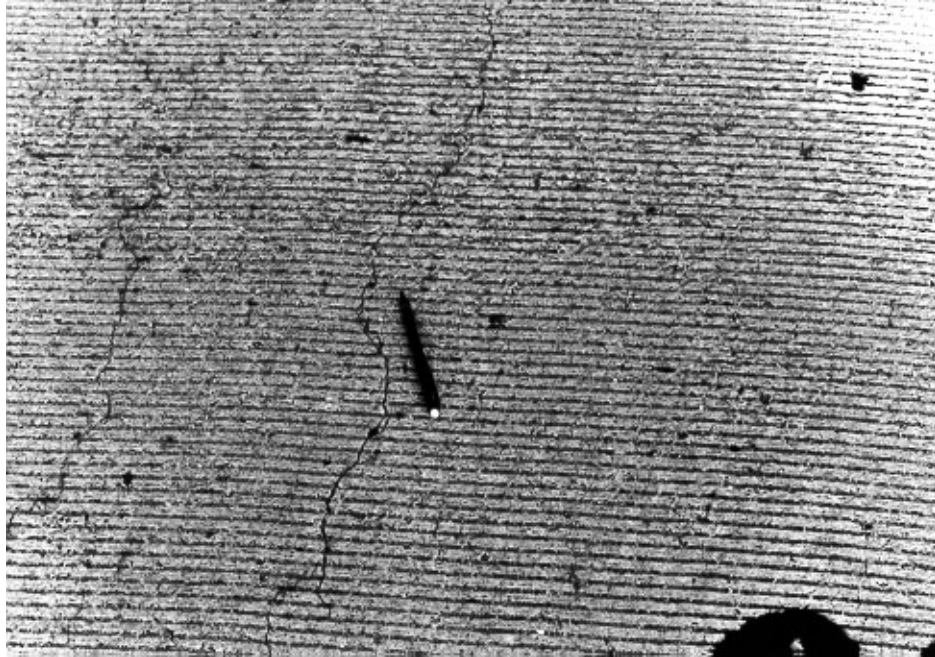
Deck Cracking – Morris and Cummings Cut Bridge (Overall View).
